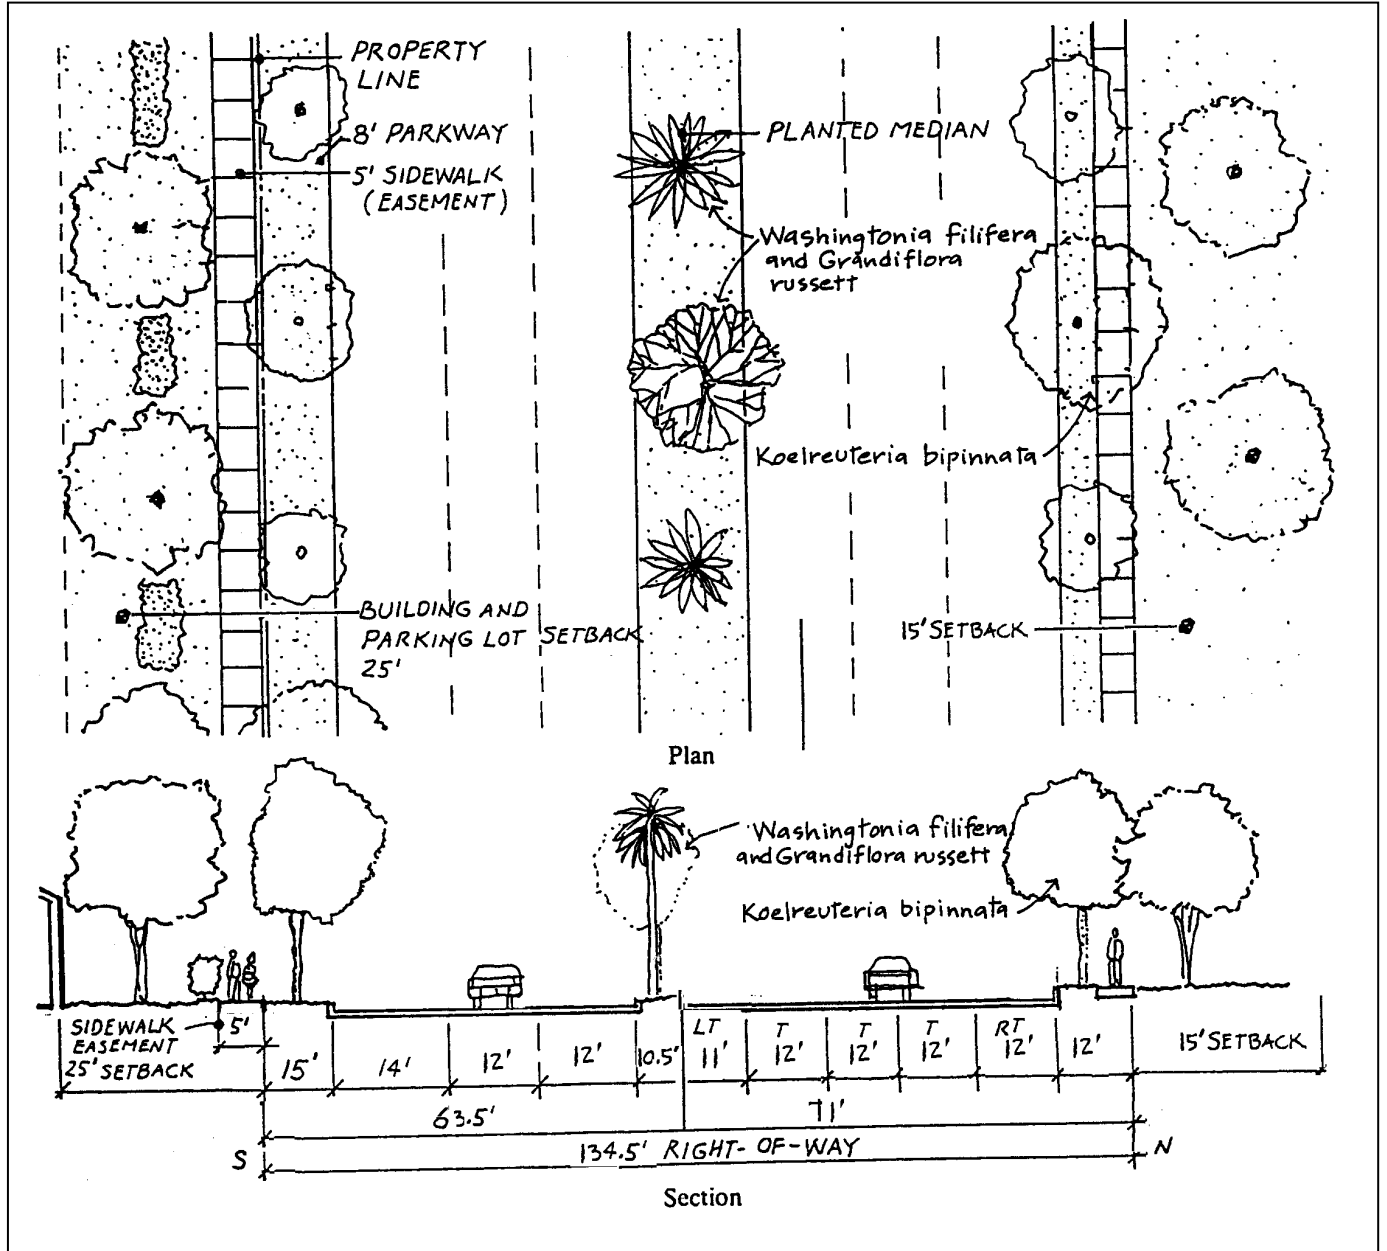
B ONTARIO AVENUE, East of Main Street
